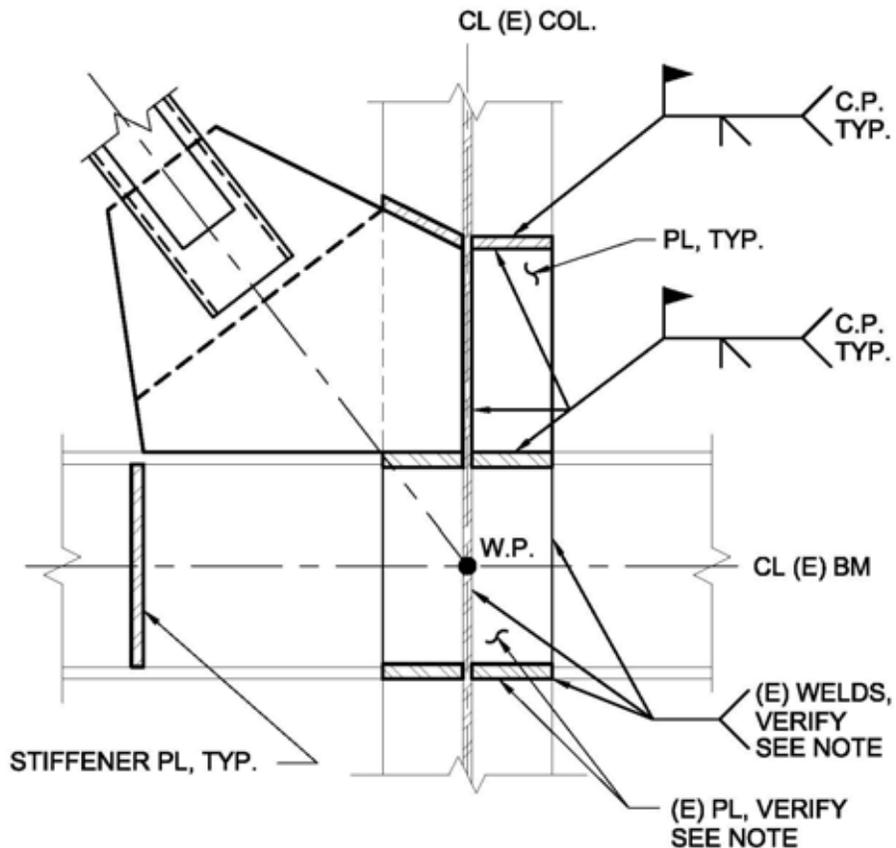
HSS Brace at Existing Beam-Column Connection in Ordinary CBF
